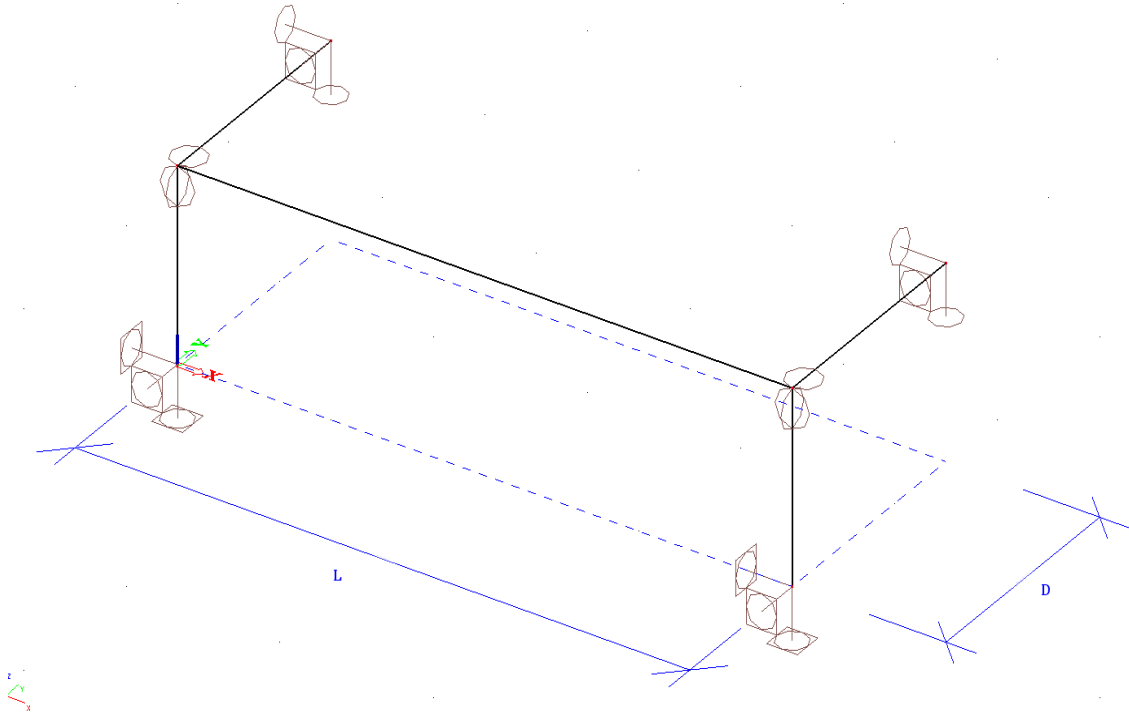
Three-sided frame with three horizontal beams and two vertical columns.
